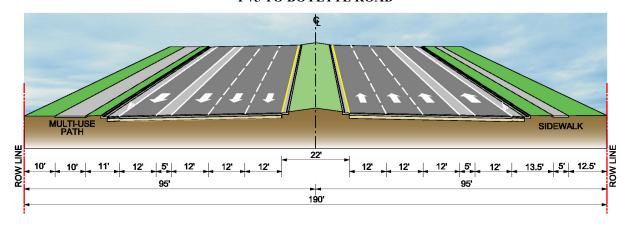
SIX-LANE DIVIDED URBAN TYPICAL SECTION BOYETTE ROAD TO FUTURE MCKENDREE ROAD REALIGNMENT
